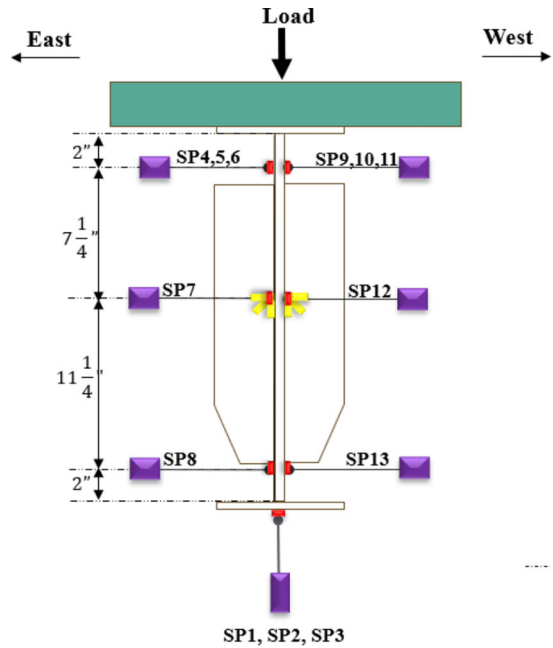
Displacement sensor layout (front elevation): Specimen 7.
